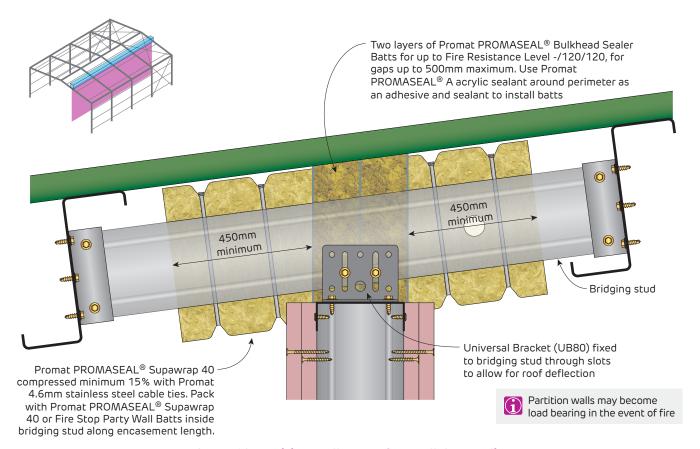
Partition Wall to Roof - Parallel to Purlins
